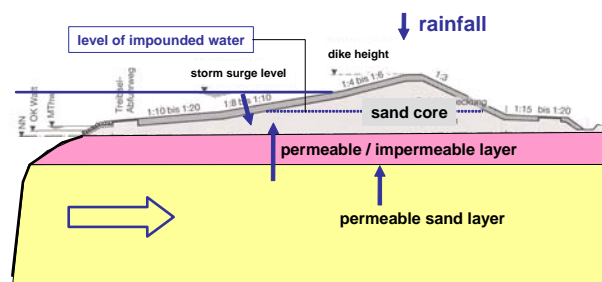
Schematic cross section of a dike with sand core and permeable/impermeable soil layers
